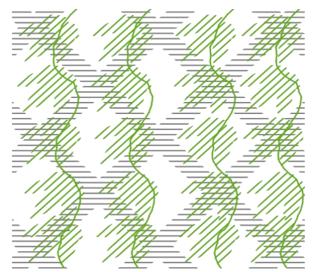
Elevation of vegetated mat living wall system (Author, 2016)
